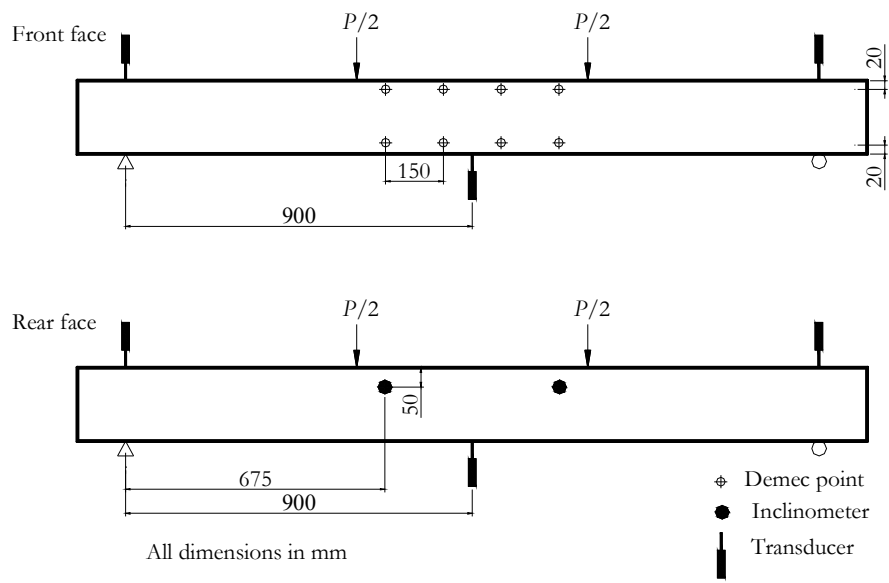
Instrumentation details for beam C2-212-D1-A.
